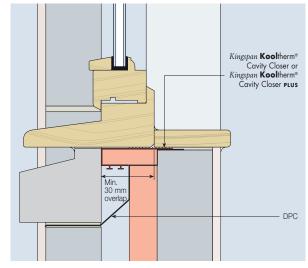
Sill Detail Incorporating Kingspan Kooltherm® Cavity Closer
